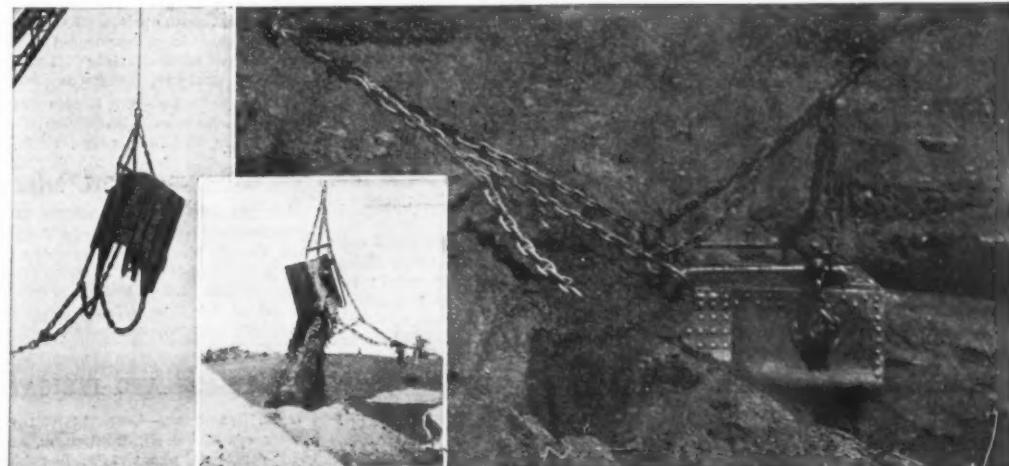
THE HAYWARD COMPANY'S IMPROVED DRAG SCRAPER BUCKET.
